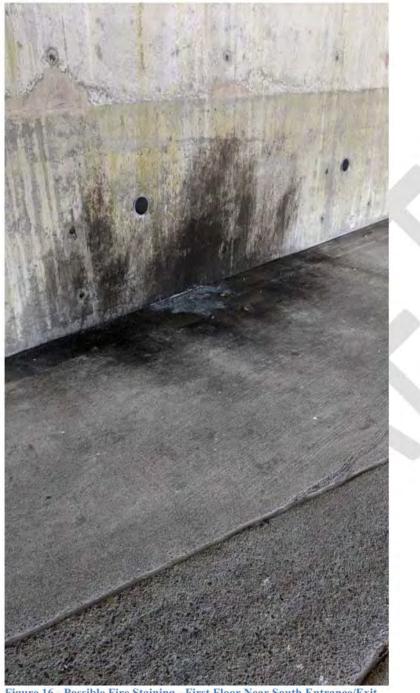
Possible Fire Staining - First Floor Near South Entrance/Exit
